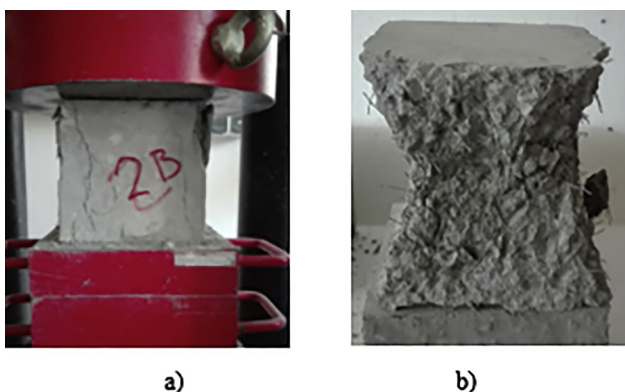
Strength in compression of fiber concrete cubes, a) testing in jack, b) sample after failure
